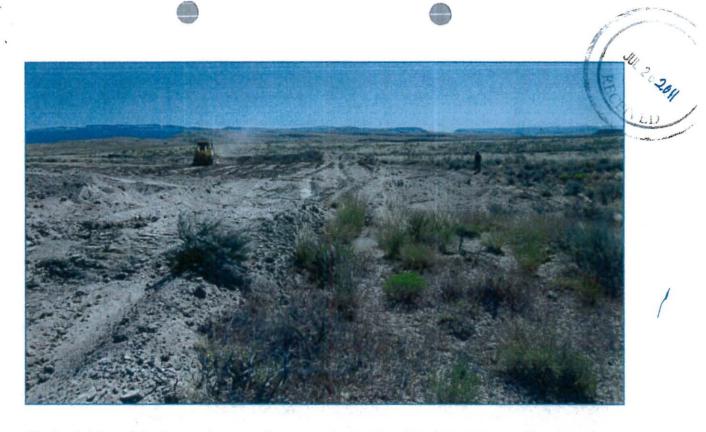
(above) looks west across the area where Komatsu dozer was working to salvage topsoil. Photo 2 (below) looks south along a road that has been established that connects the main mining area with a topsoil stockpile area.
